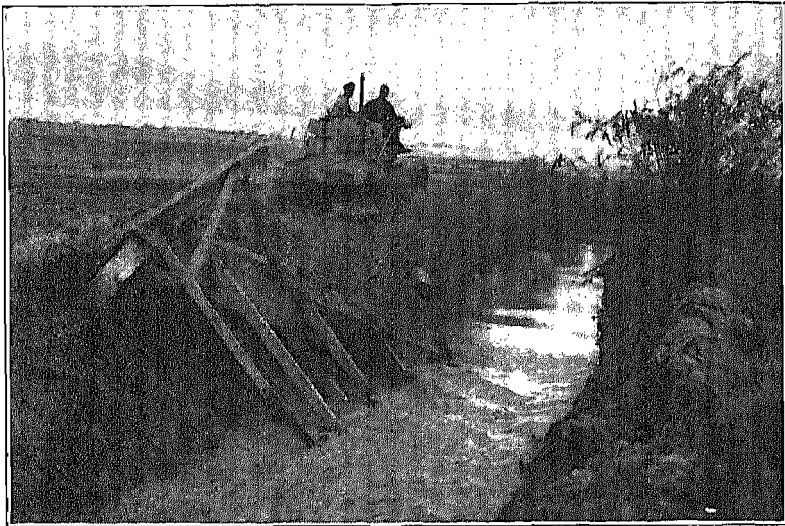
This Gregerson ditcher with 18-ft blade for clearing canal banks weighs 3.2 tons and will operate in 5-ft-depth ditches having steep banks. (Courtesy Robinson Machinery Company.)
